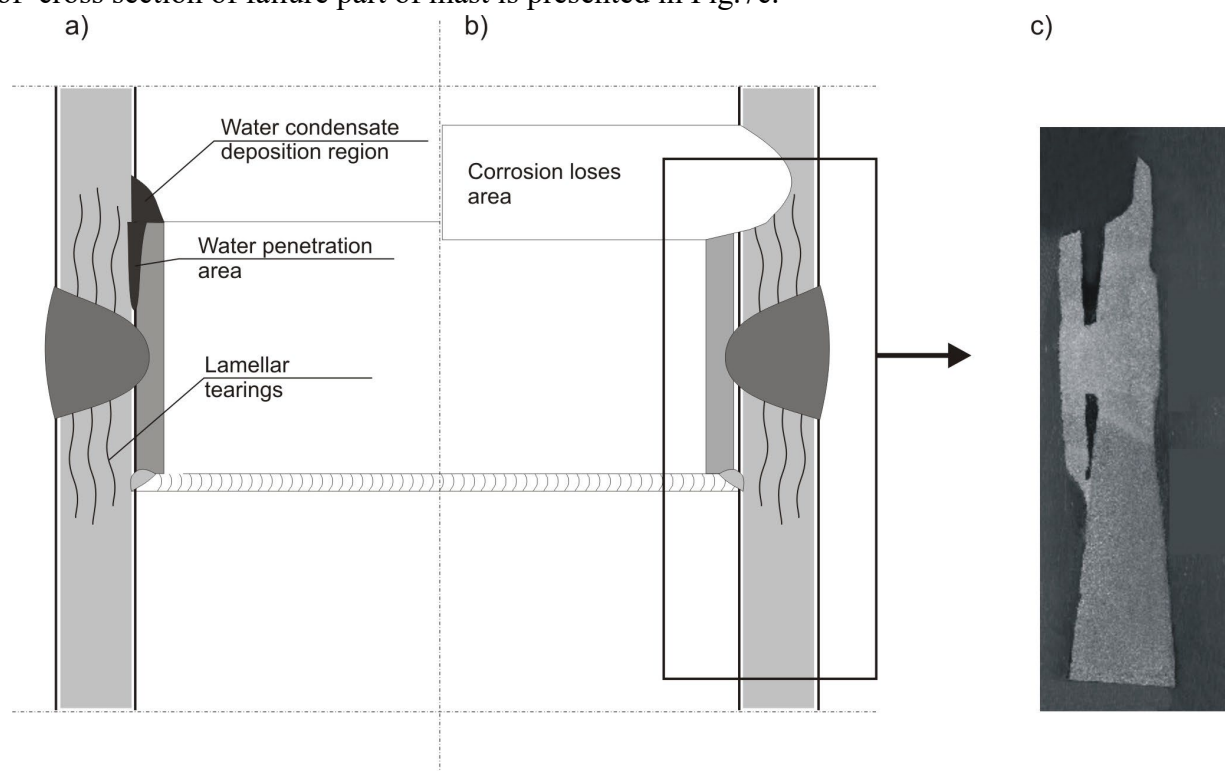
Way of destruction of the segment connection of mast tubes: a) the places of water penetration and lamellar tearing; b) places of mast skin weakening; c) fractography of corroded joint region
